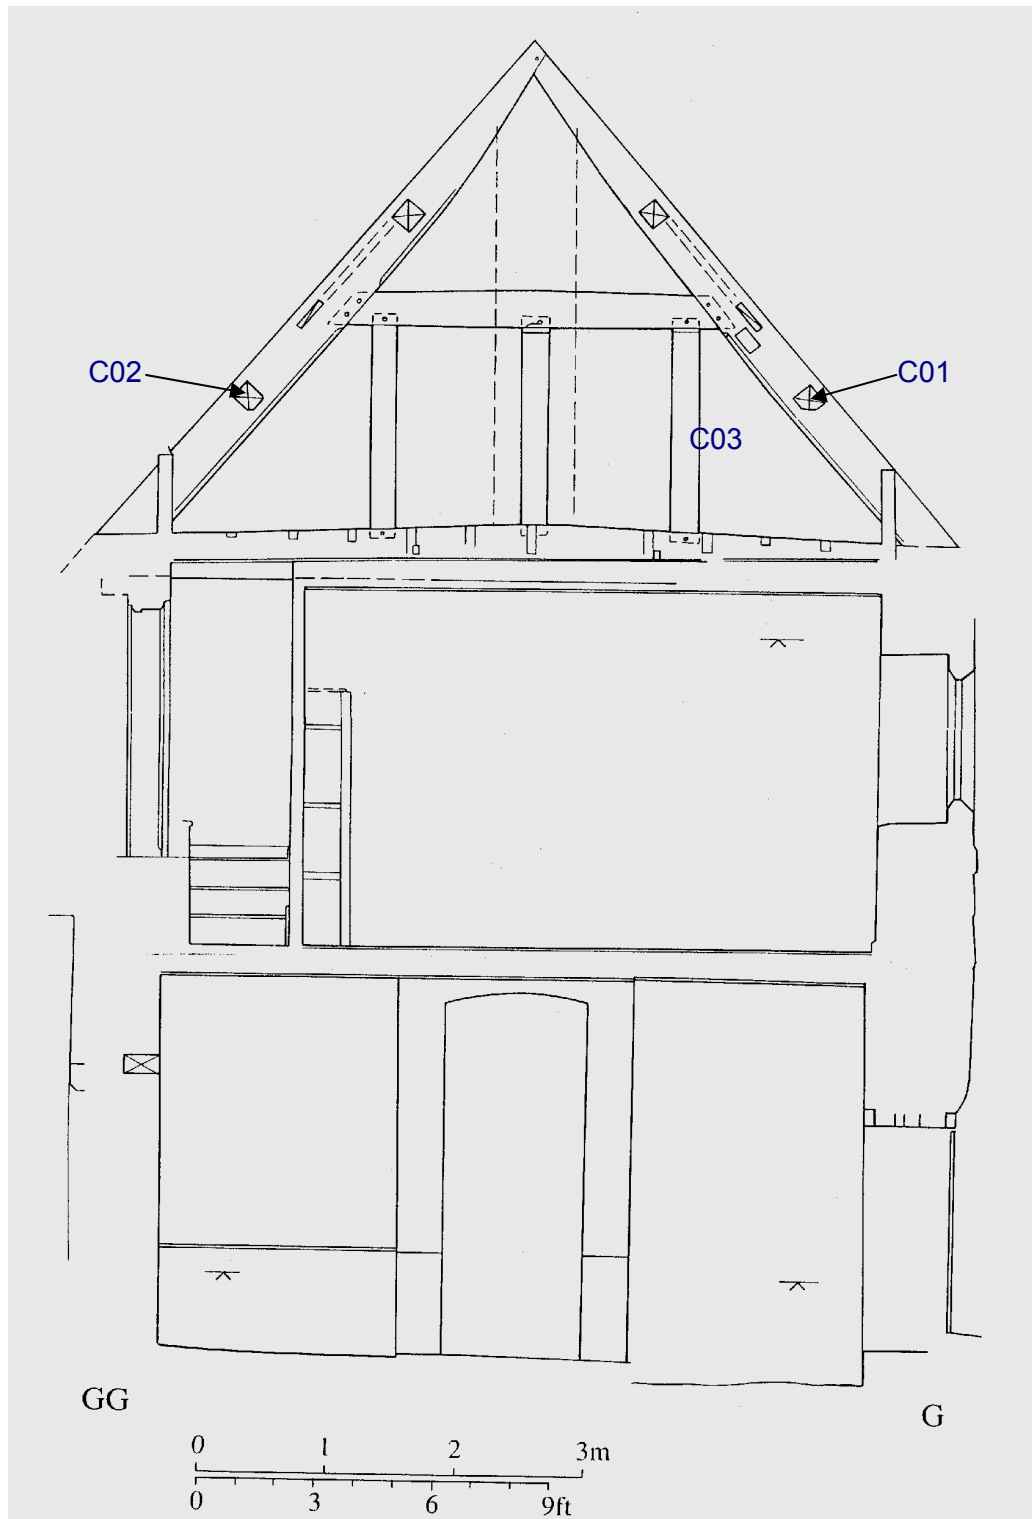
Annex; drawing to show sample locations from truss G (viewed looking west) (after Jean and Bob Meeson)
